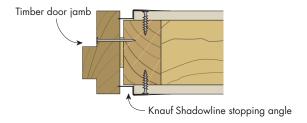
Timber Door jamb With Shadowline Stopping Angle - Plan
